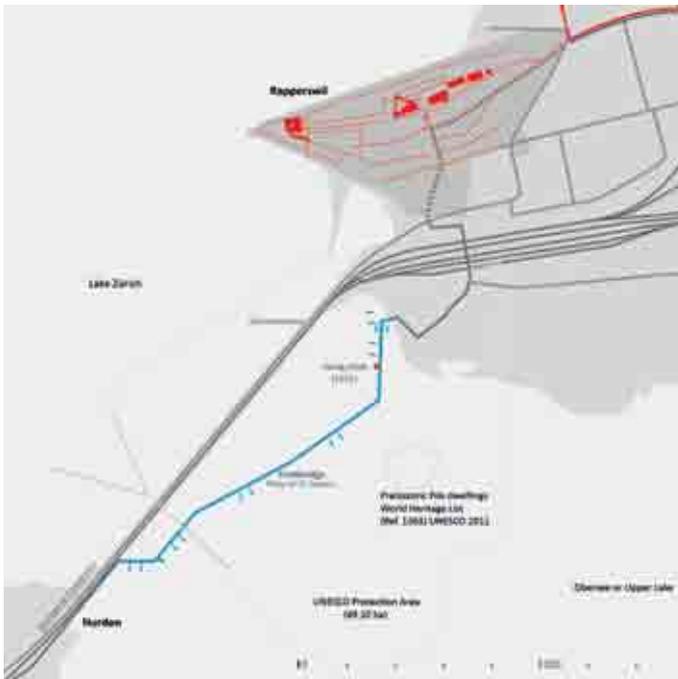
Rapperswil-Hurden footbridge plan, Lake Zürich, Switzerland.
